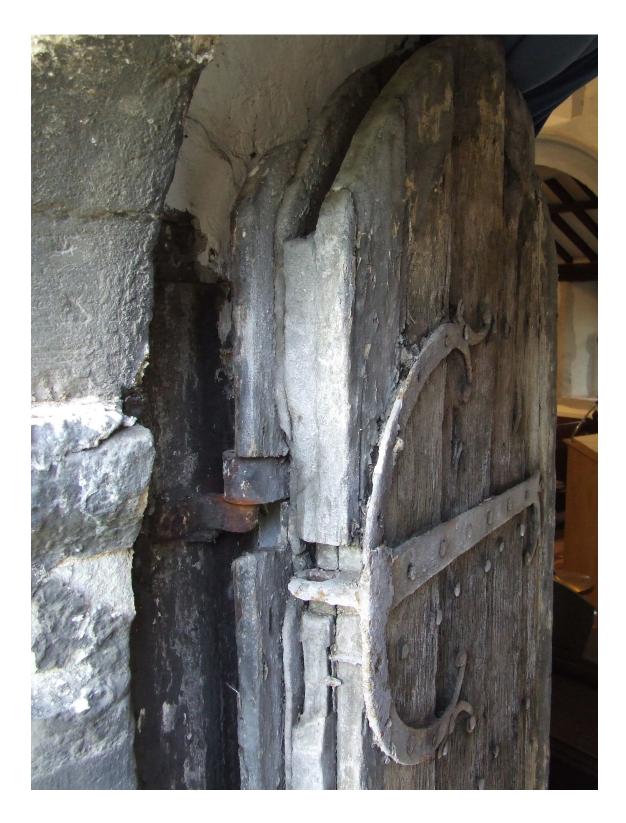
View of the door showing the front boards, the ironwork, the original pintle, the very thin rear boards, and the thicker rear cladding and present pintle
